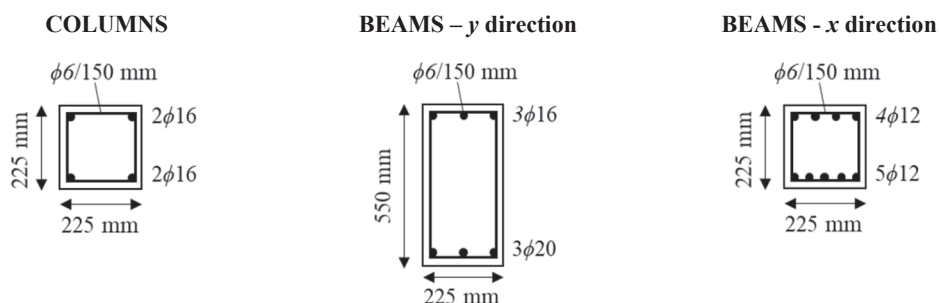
Typical cross-sections of columns and beams for the 2-storey school building.
